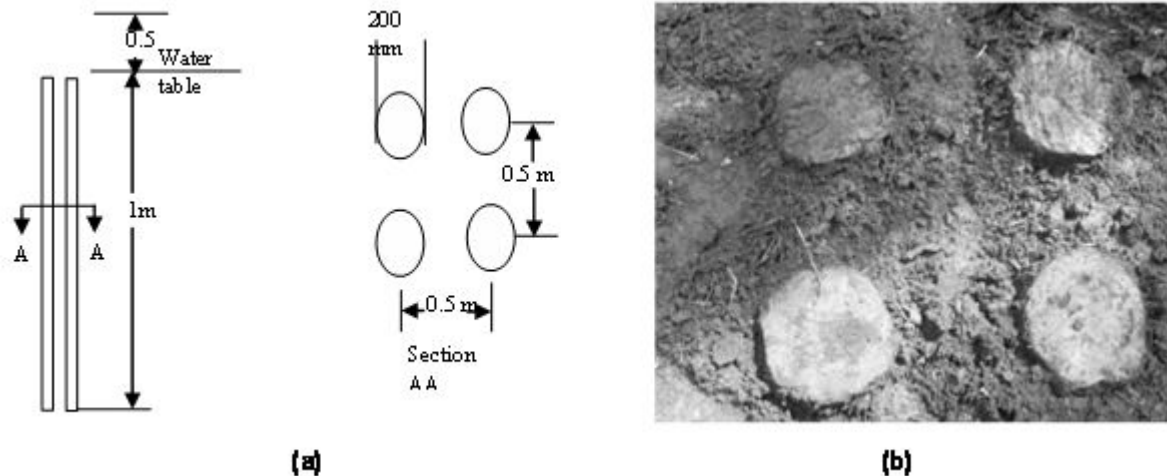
(a) Detail of group column (not in scale) (b) group column after 28 days.
